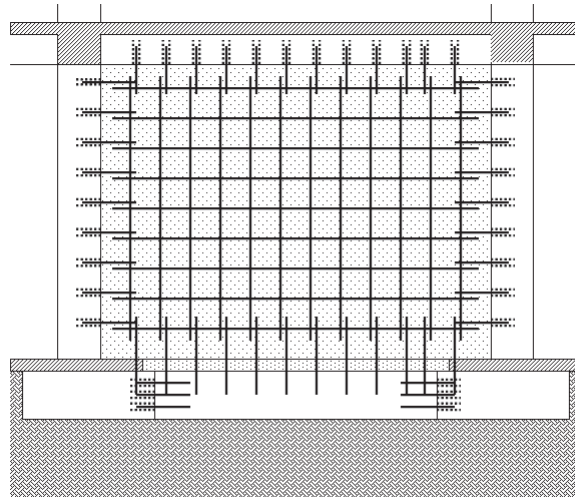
Detail of the frame retrofit with structural wall in vertical section
